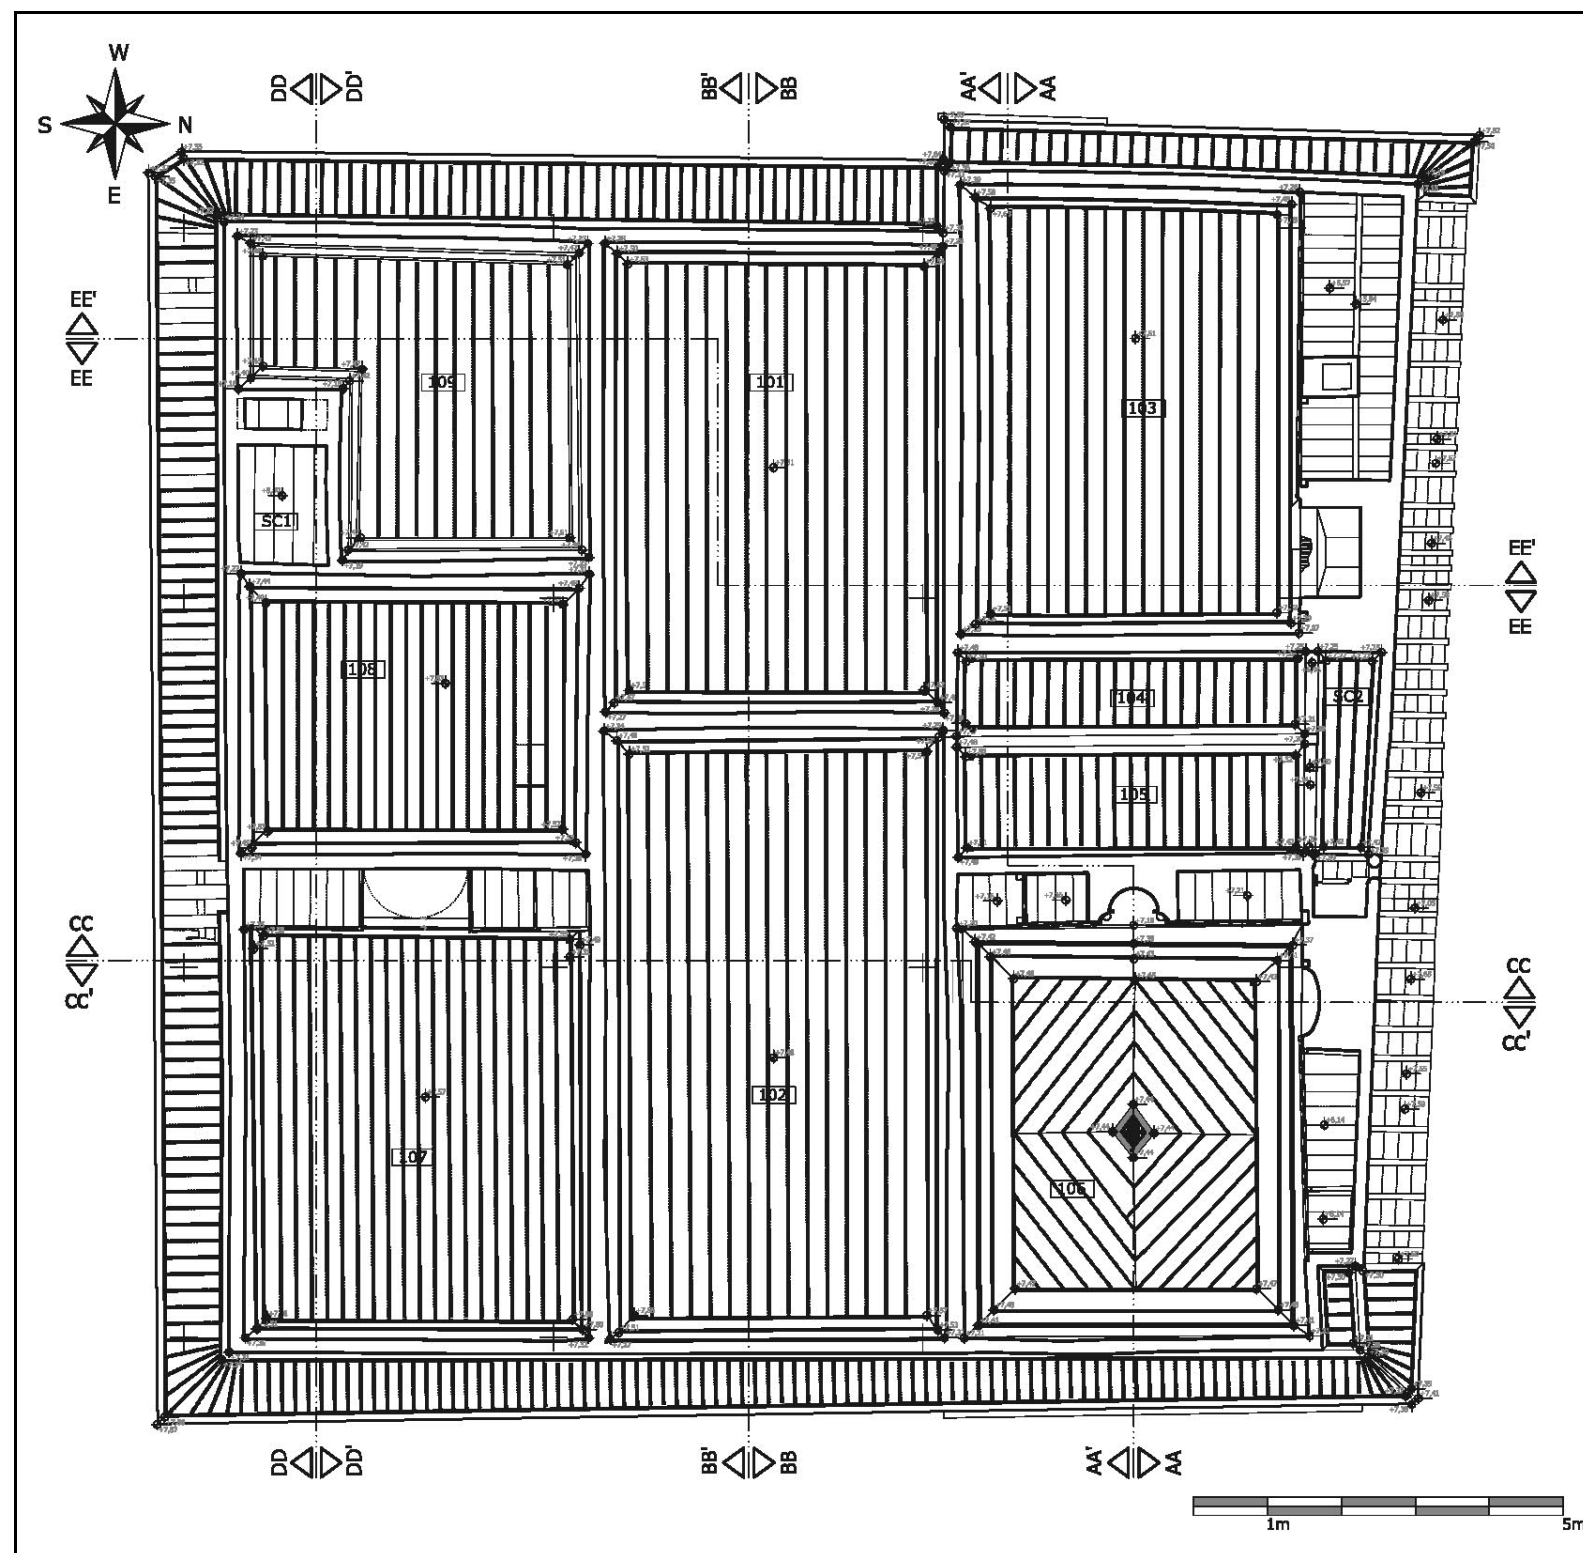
First Floor Reflected Ceiling Plan: 1/100 (presented in 1/50 at Jury)
